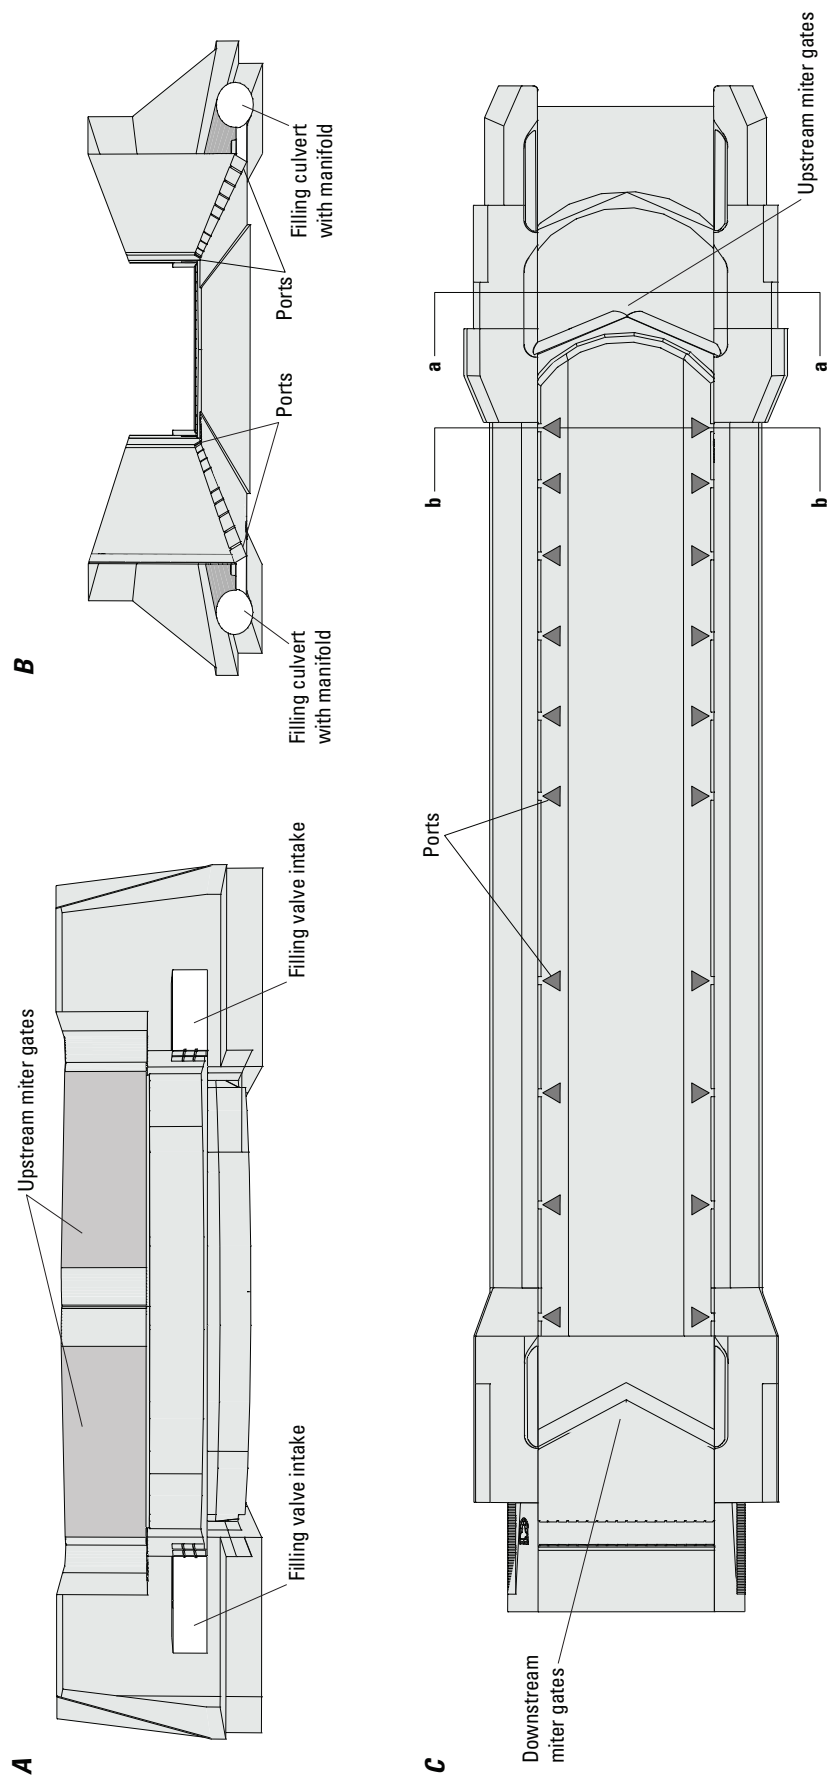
Schematic of the lock chamber. *A*, Section view of the filling valves looking downstream toward the miter gates. *B*, Section view of the side-ported filling and emptying system looking downstream from the upstream lock gates. *C*, Plan view of the ports and miter gates. Modified from K. Sunderman, unpub. data, 2015.
